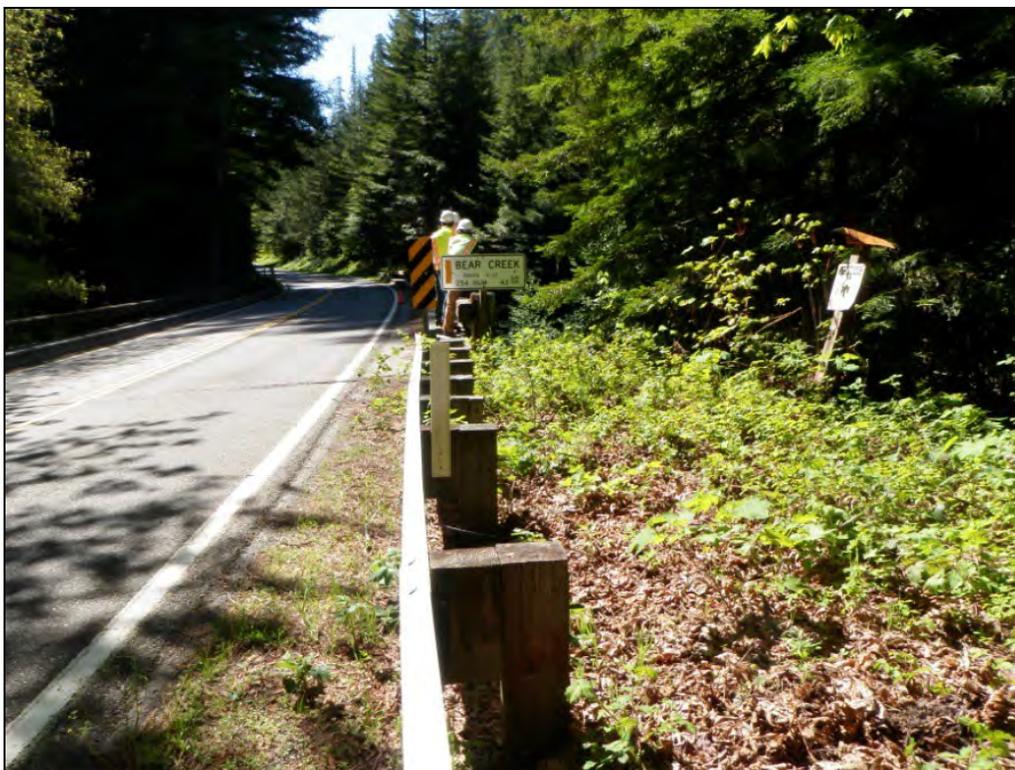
Location 4: Bear Creek Bridge (Br. No. 4-12), HUM-254, PM 43.02, facing north
